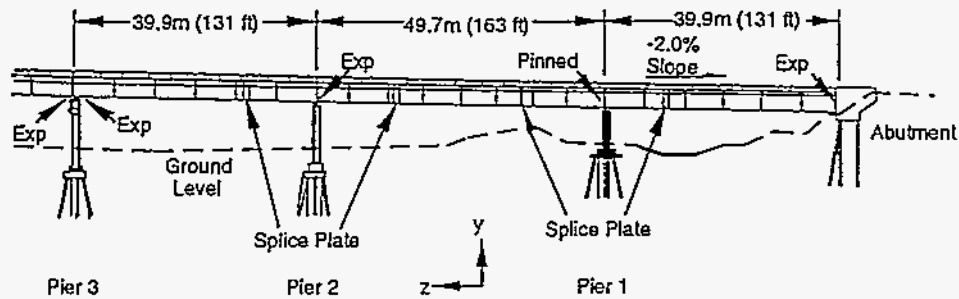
Elevation view of the portion of I-40 bridge that was tested
